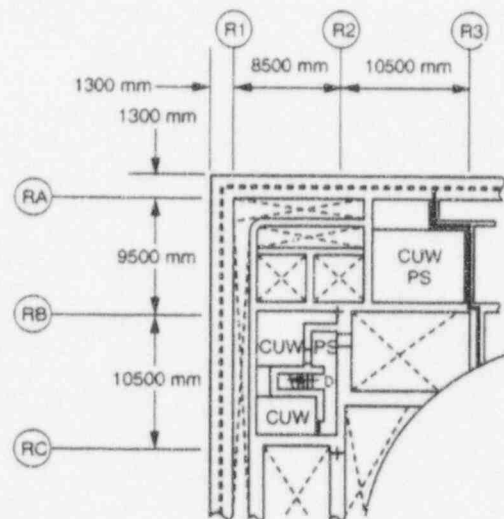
Reactor Building Arrangement—Elevation -5100 mm
